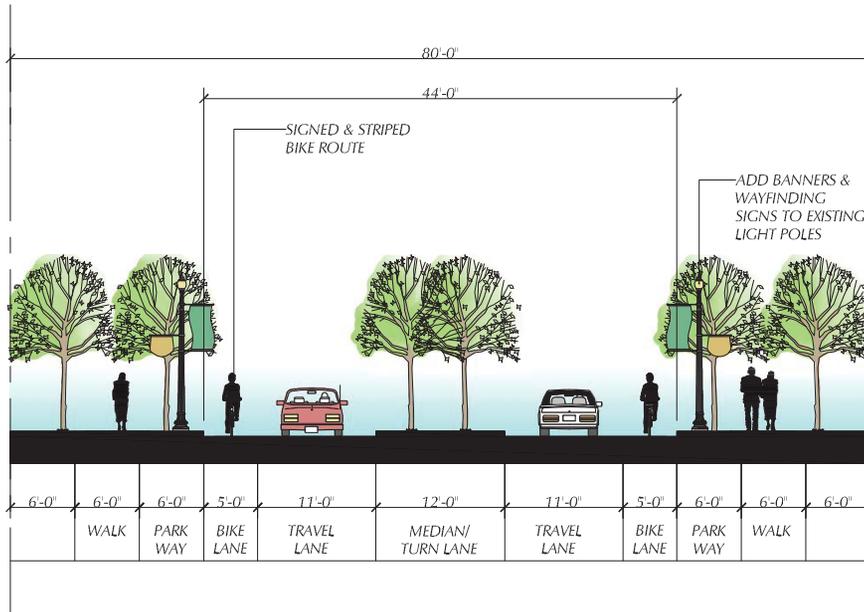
Streetscape Sections | MEADOW RD (FUTURE DOWNTOWN EXTENSION)
